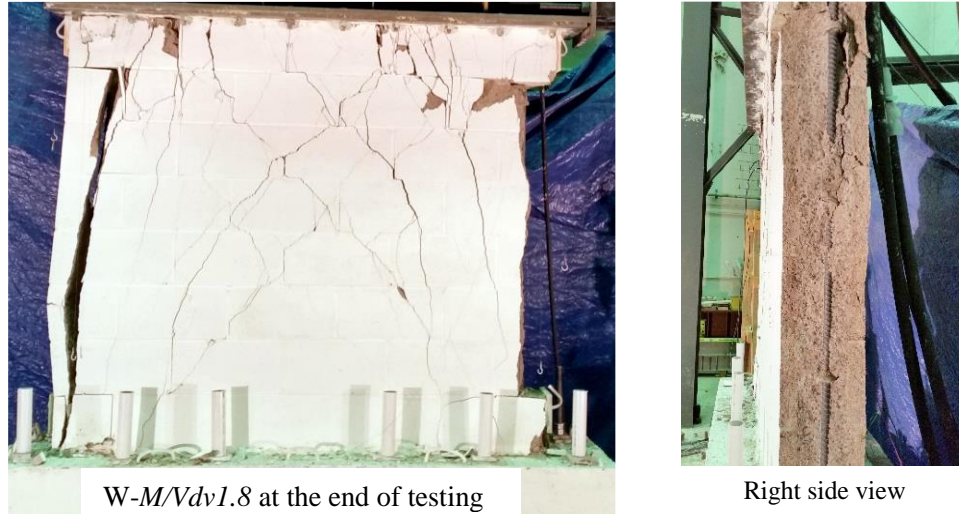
Final crack pattern of tested wall W- M/Vd_v 1.8
